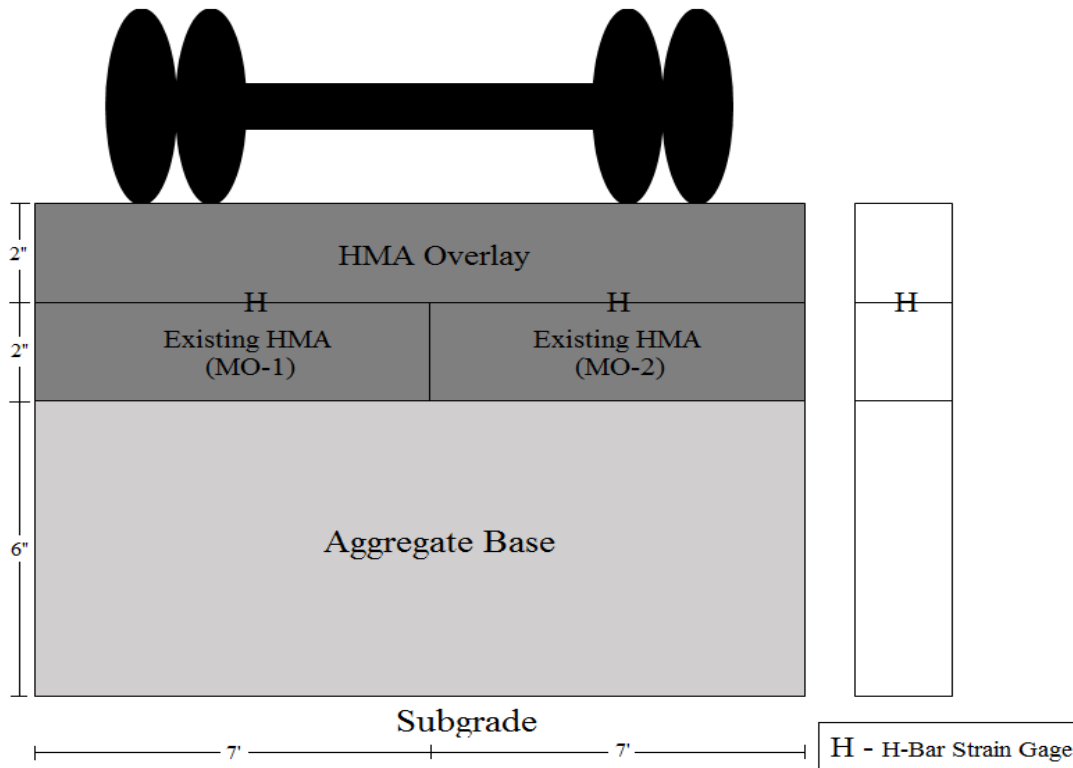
Schematic of Instrumentation Layout in Test Sections for CISL 17
